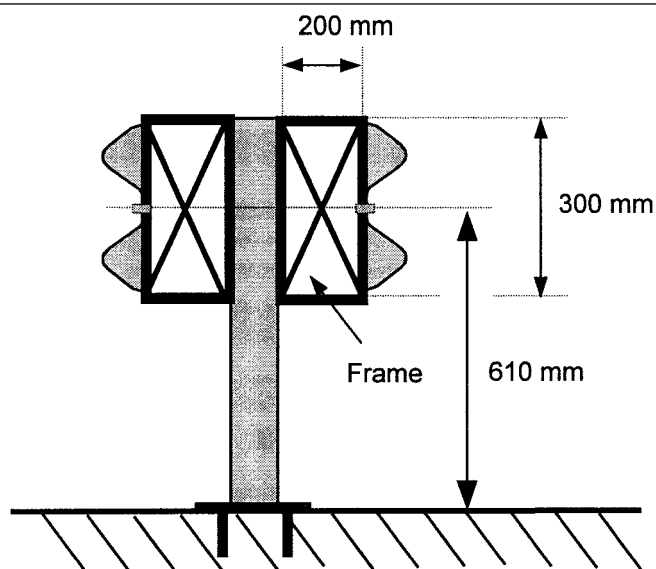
Double sided UCB barrier on Z-posts (Surface mounted)
